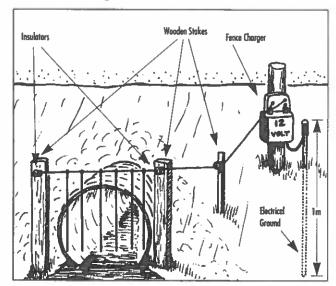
Electric Beaver Repelling Device for Protecting Culvert Entrance.
